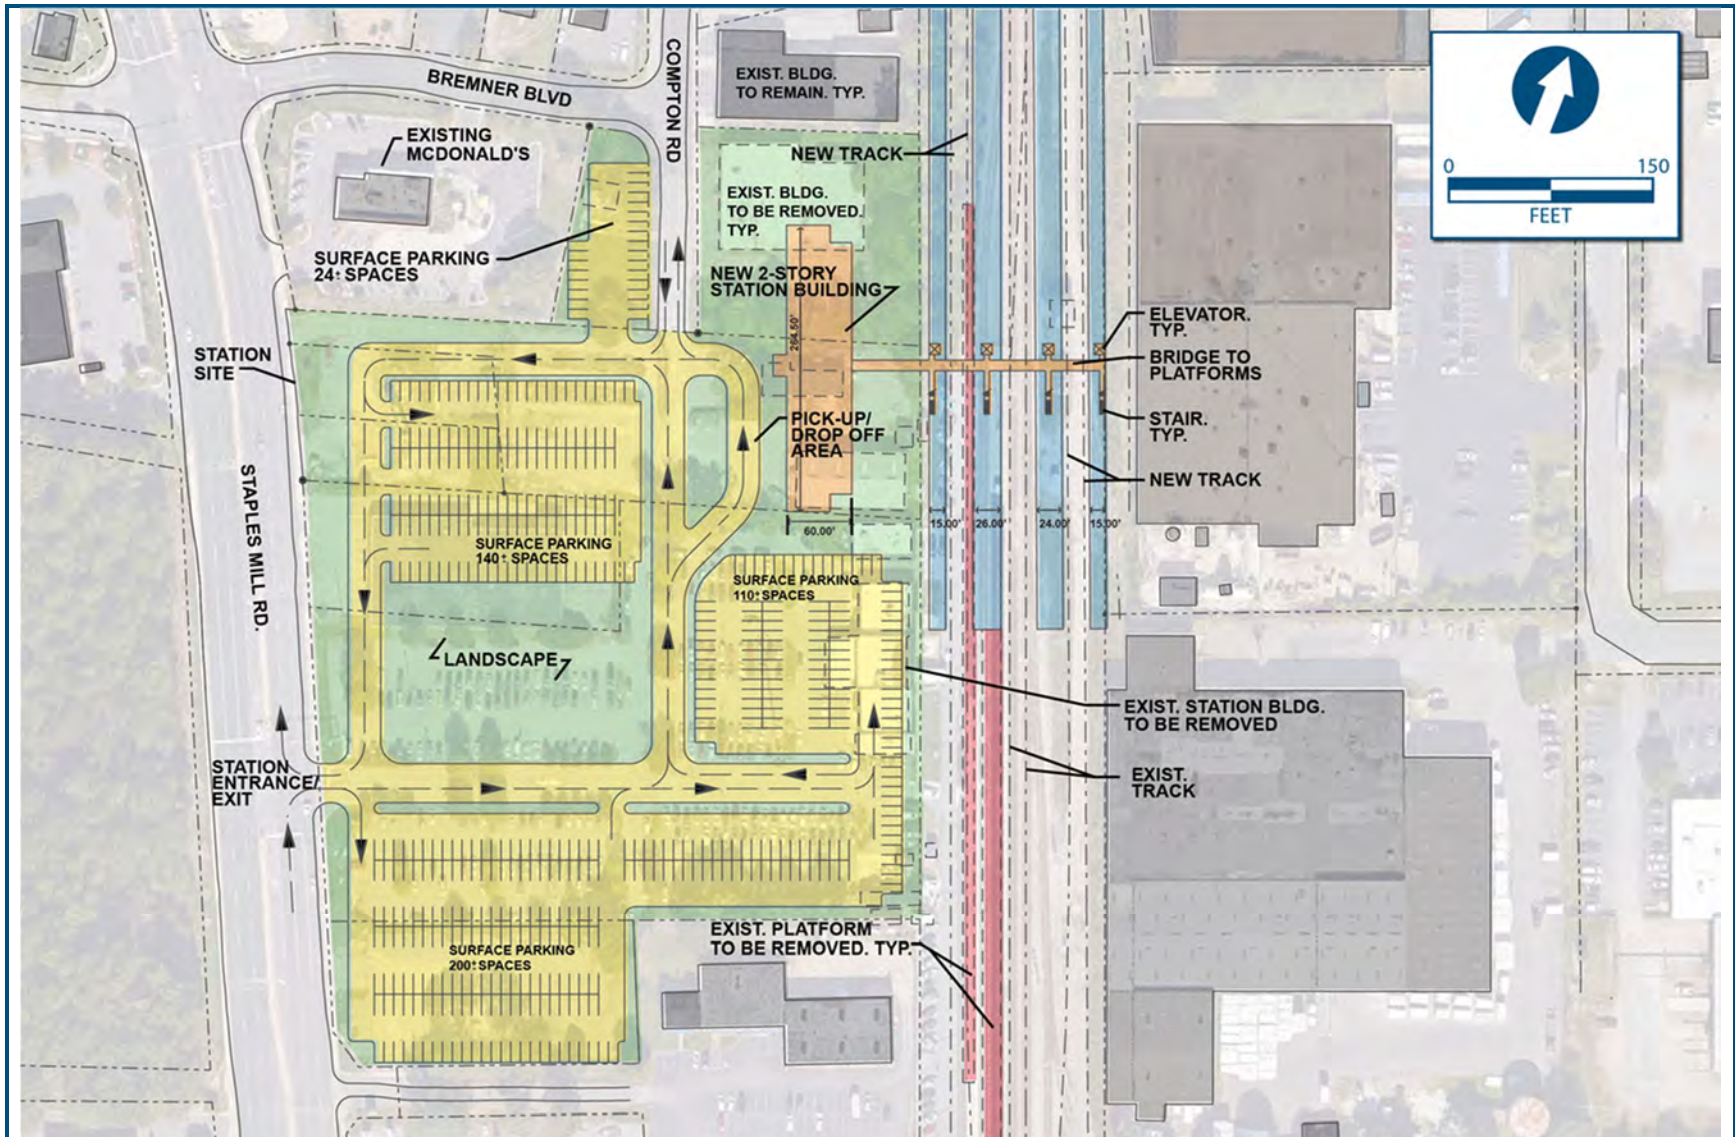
Staples Mill Road Station Improvements for Build Alternative 6G
